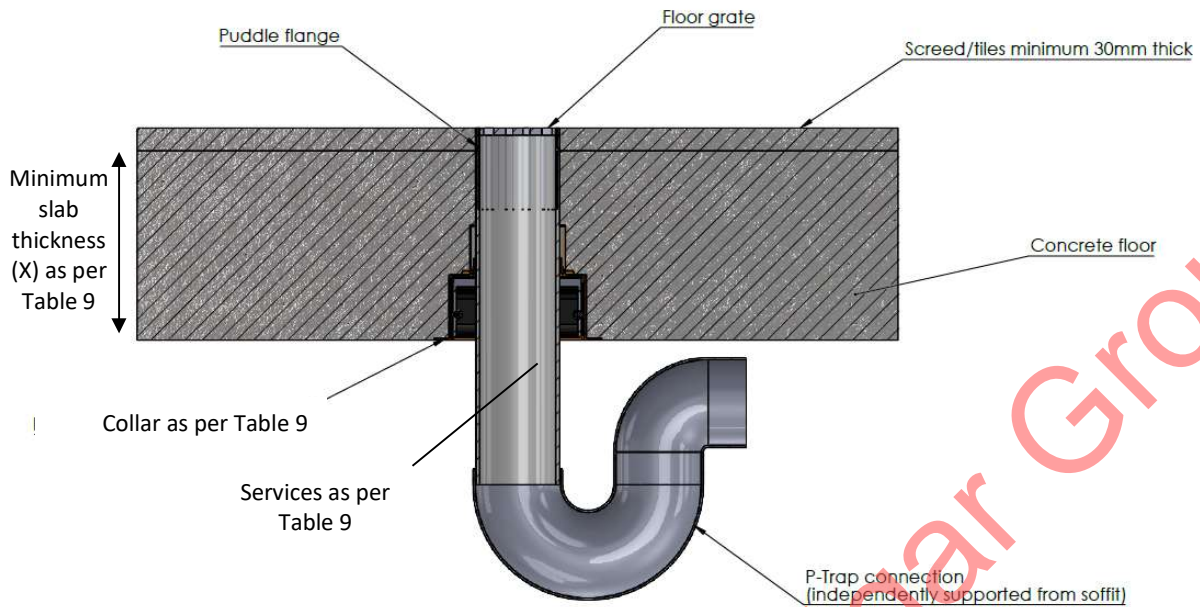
FW Cast-in collar with Floor waste pipes – P trap
